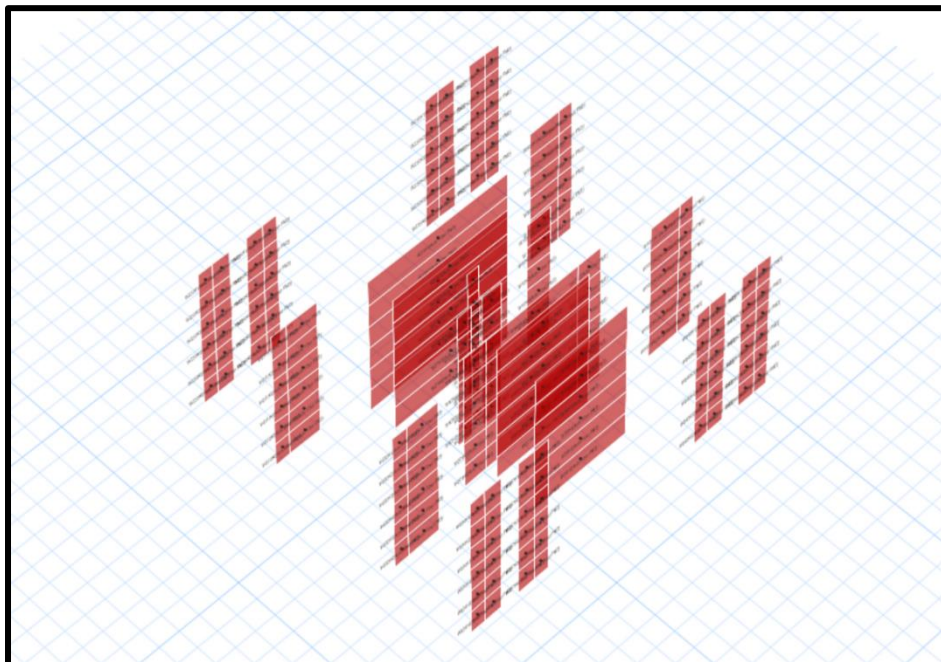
Shear Walls Assigned with Fiber P-M3 Hinges
